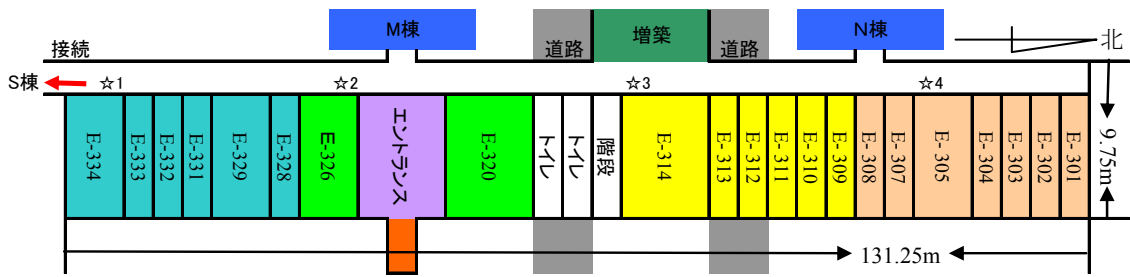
Uji campus main research building (The plan of the third floor of east building)
